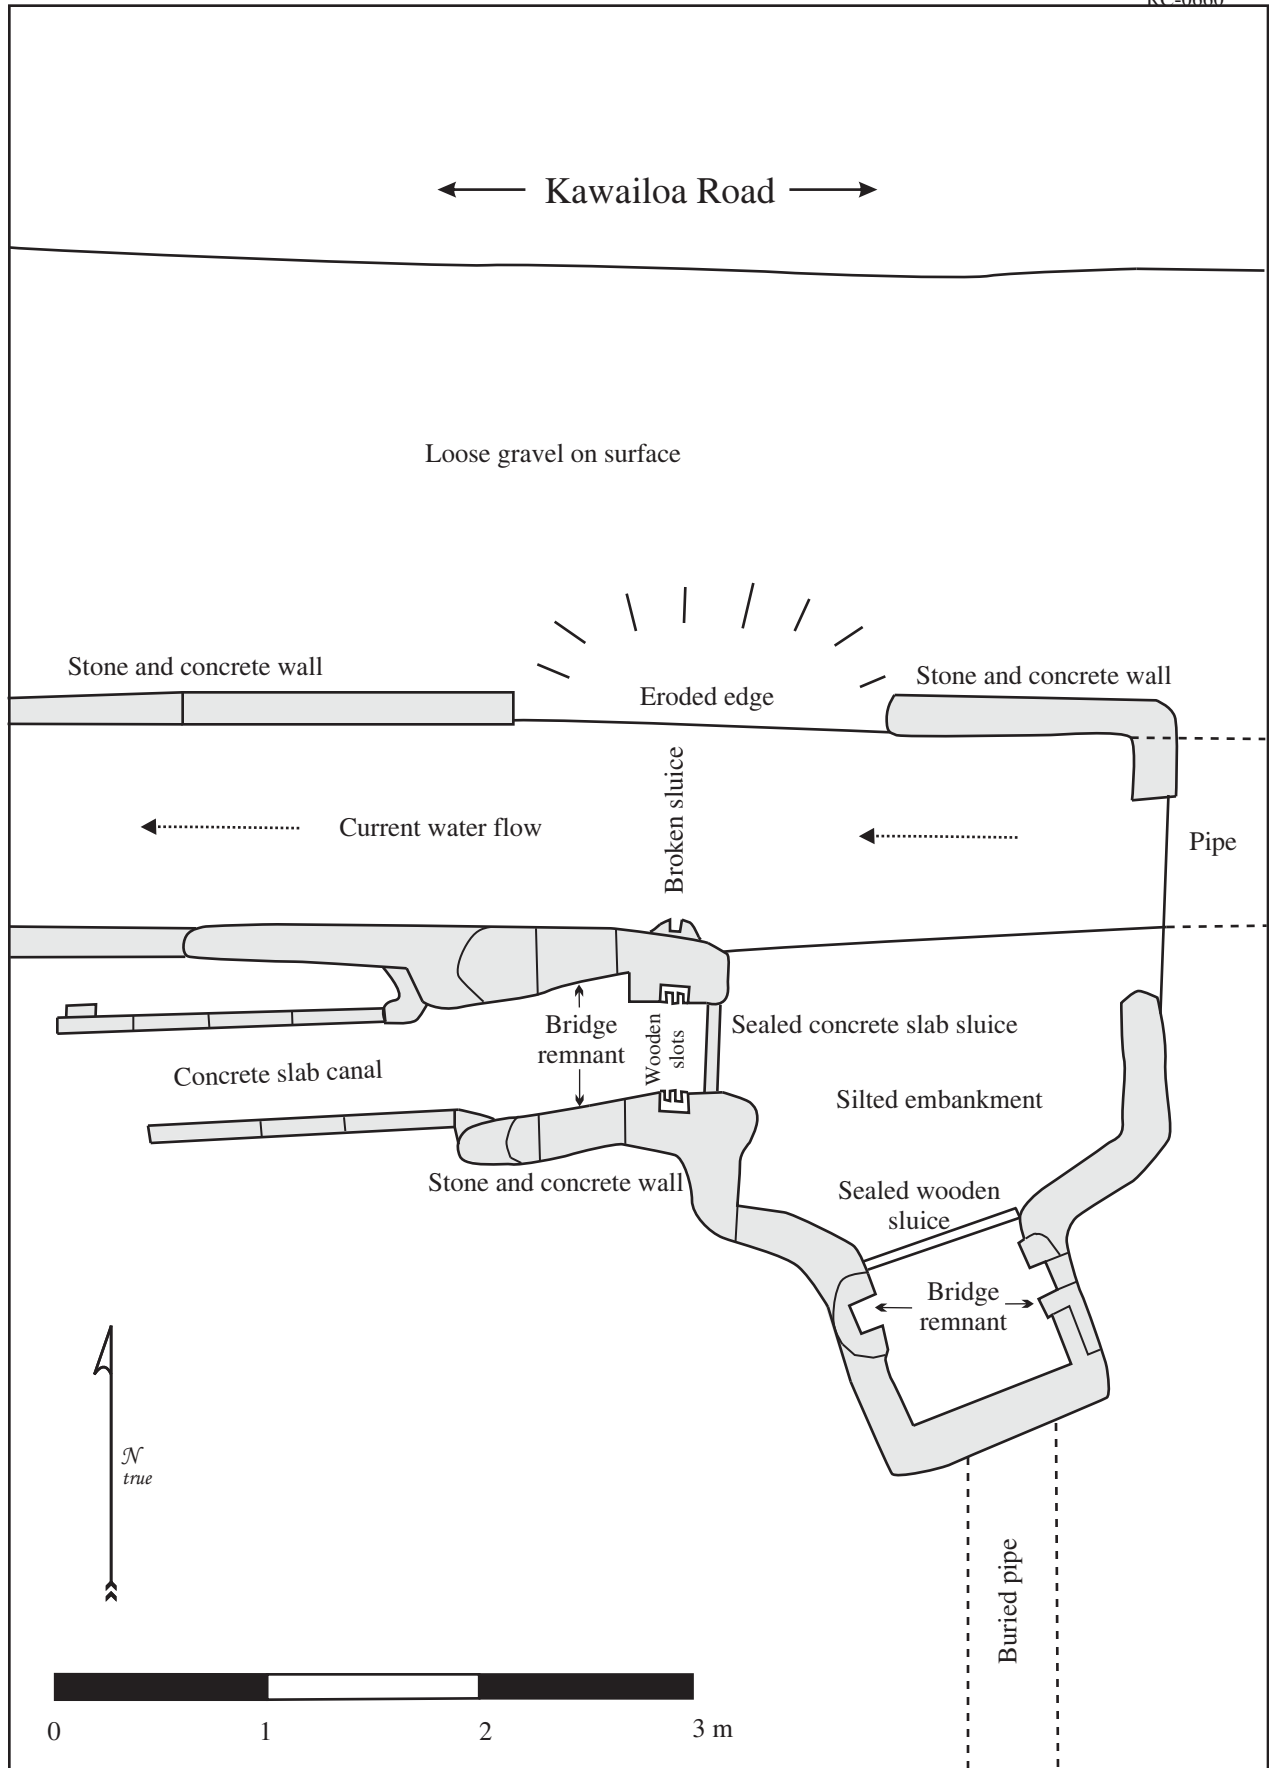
Site 7159 Section 6 sluice gate complex plan view.
